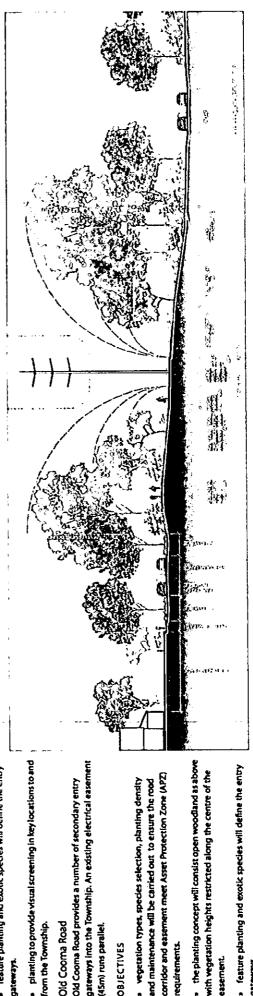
Typical Old Cooma Road Easement Section - Looking South
